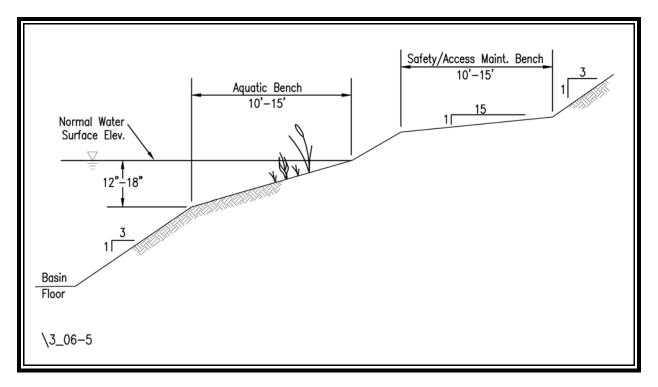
5 Typical Retention Basin Aquatic Bench - Section
